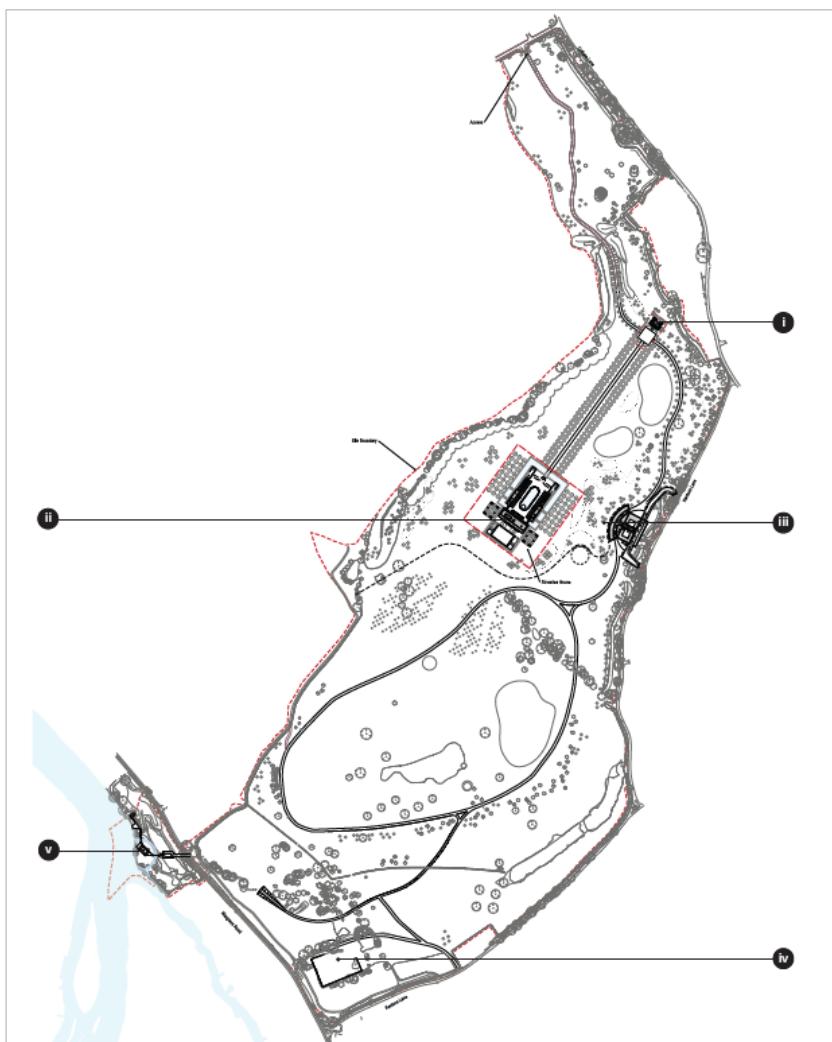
Site Location showing approved scheme (i) Gatehouse, (ii) Main House, (iii) Estate Management Building, (iv) Staff Village, and (v) Riverside Pavilion.
